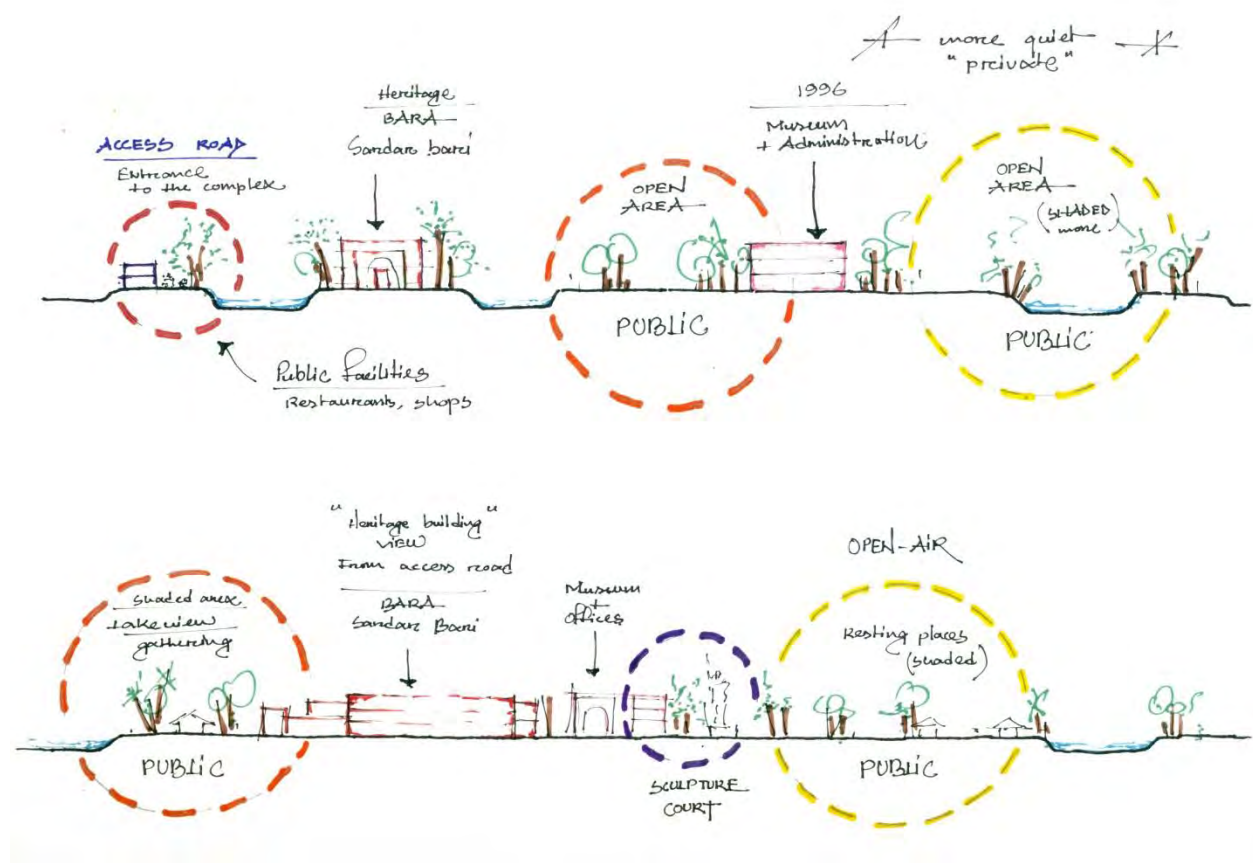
Longitudinal and transverse cross section through existing site (Source: Author)
